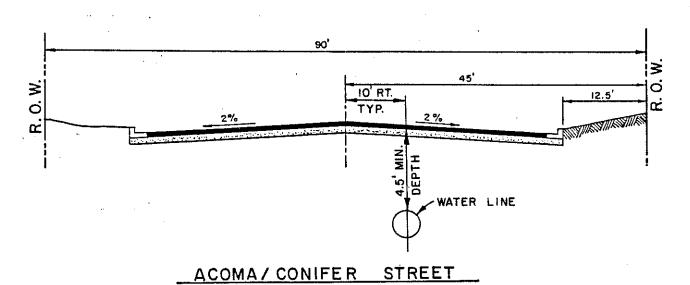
TYPICAL WATER LINE SECTIONS
